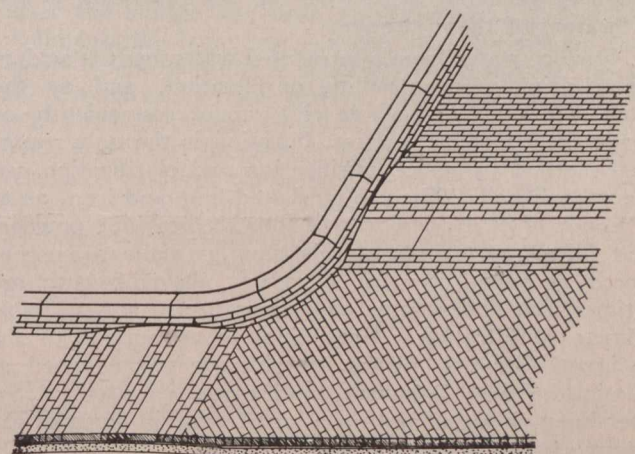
View Showing Setting of Bridge Stones at Street Corners.
